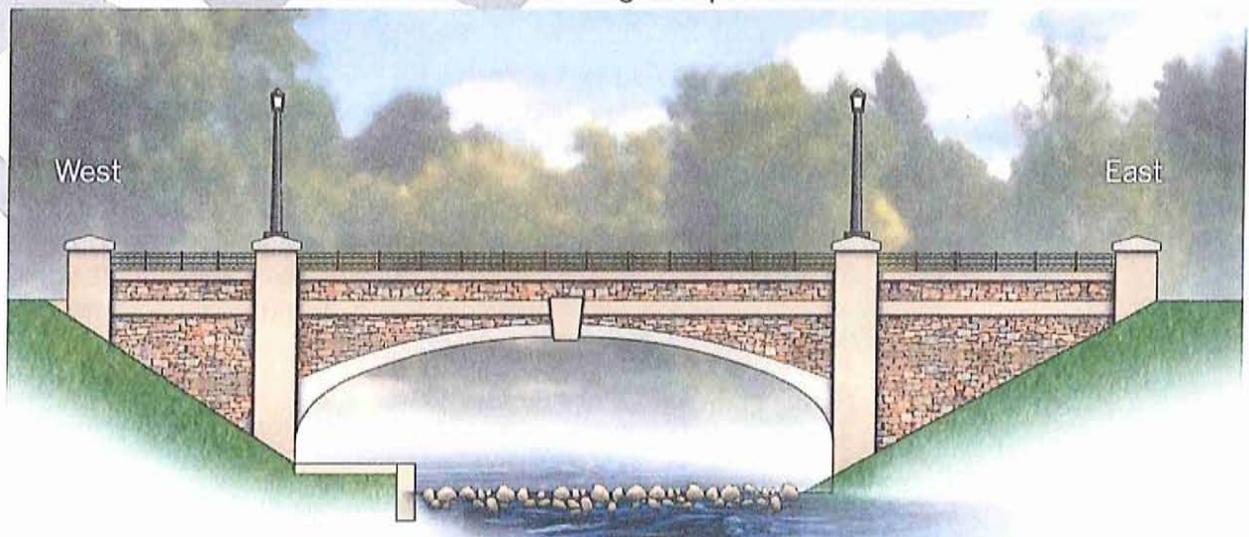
54th Street Conceptual Bridge Looking North at Minnehaha Creek
